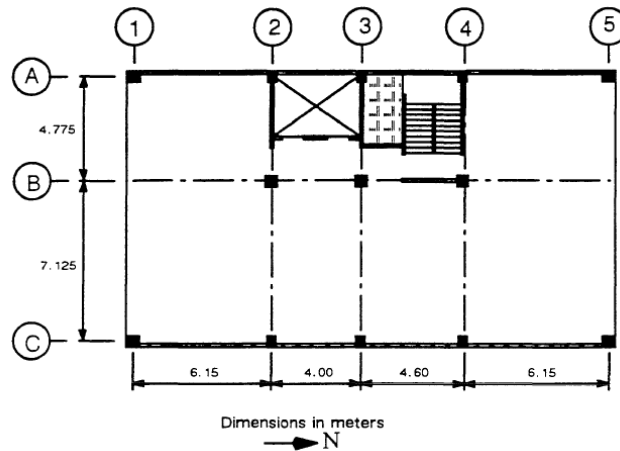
Typical floor plan for the Durango building (Downs, et al., 1991)
